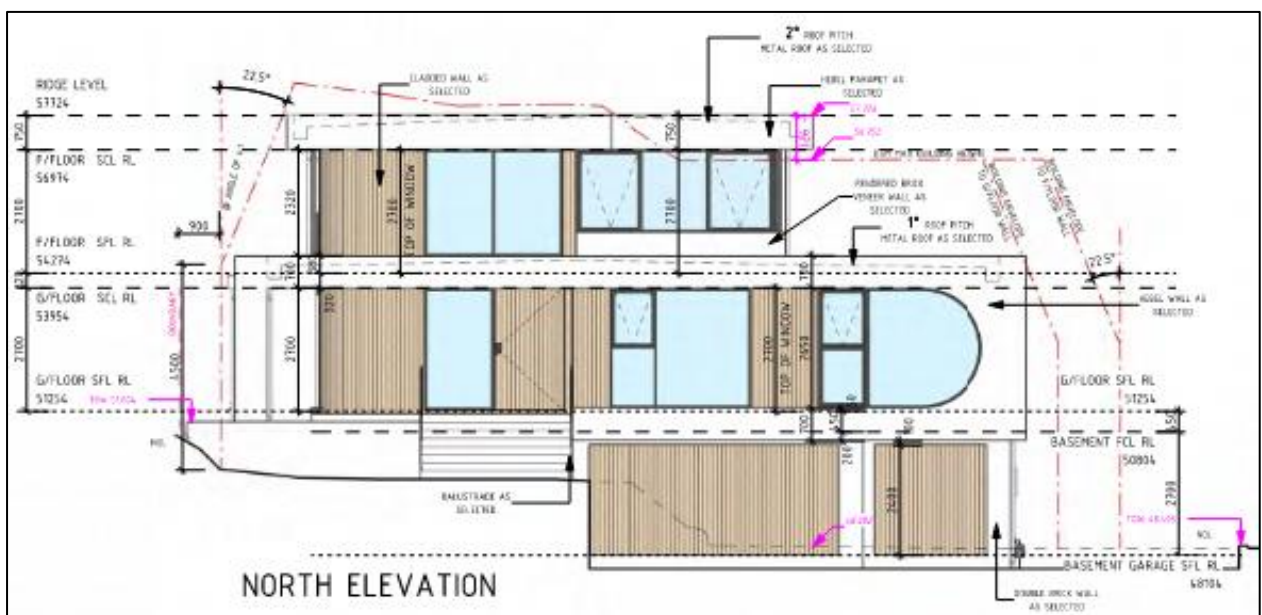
Proposed exceedance to Clause 4.3 of NLEP2012 (north elevation)
